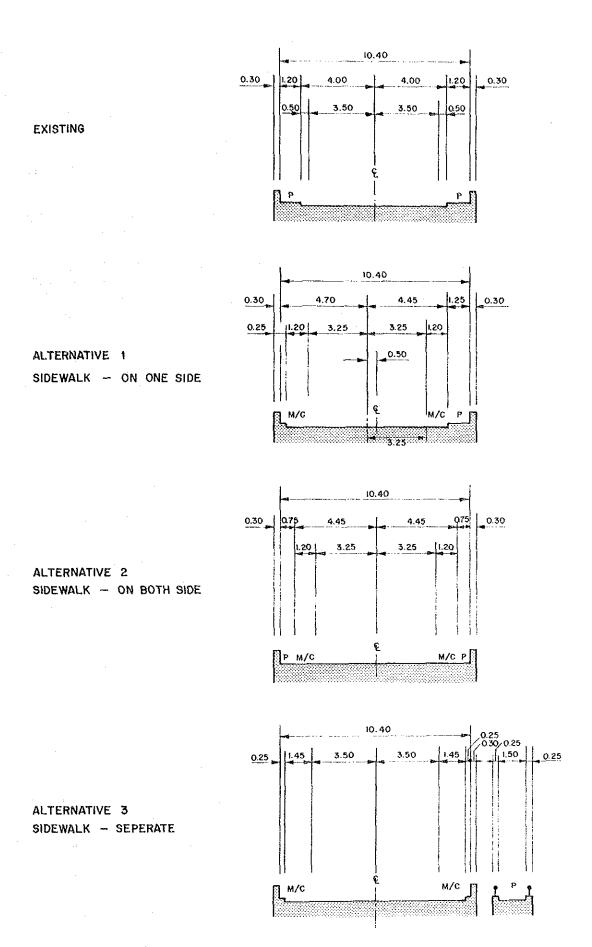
ALTERNATIVE PLAN ON THE BRIDGE SECTION
